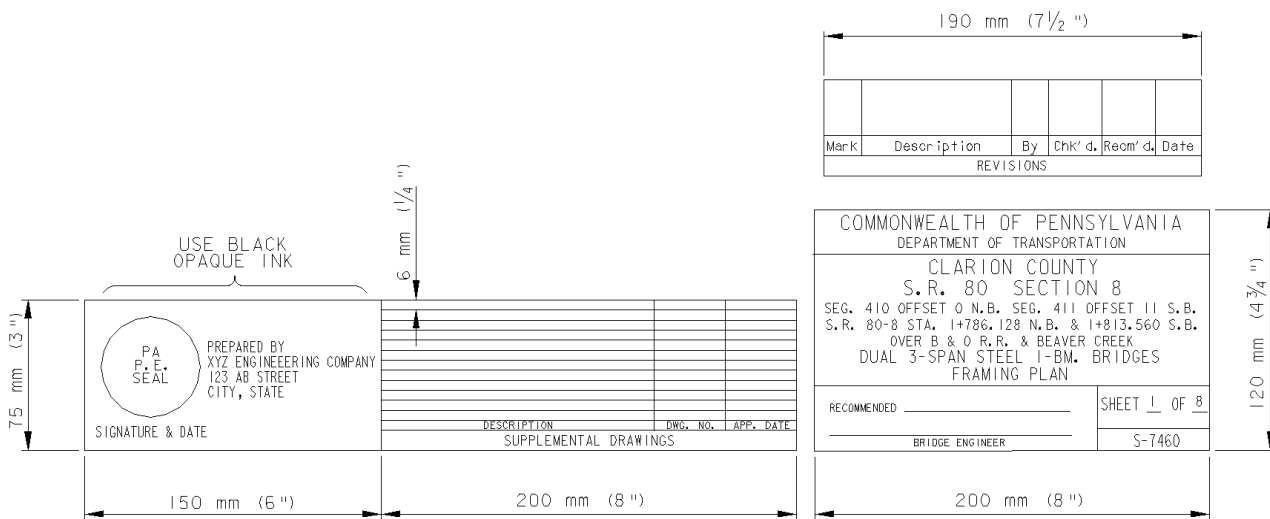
Example of Dimensions and Details for Design Drawings
